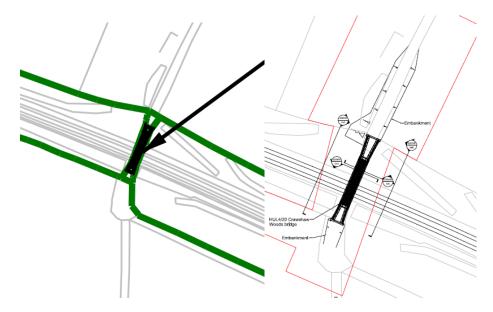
Existing and proposed Crawshaw Woods Bridge layout
